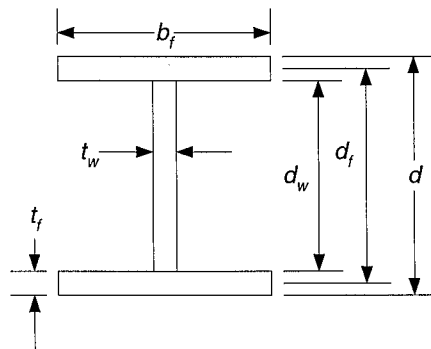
Dimension Parameters of Wide-Flange Section
